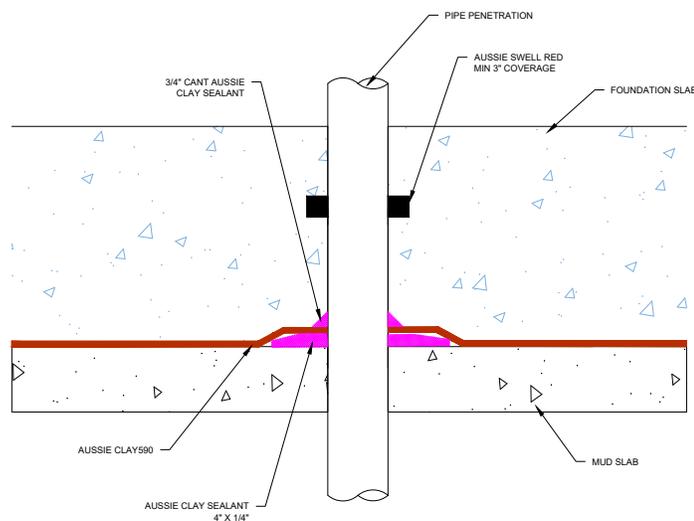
SINGLE PENETRATION THROUGH SLAB W/ MUD SLAB
